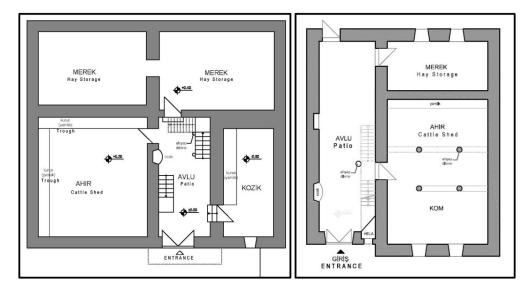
Varied Plan Types According to the Location of the Courtyard in Arapgir Village Houses.
